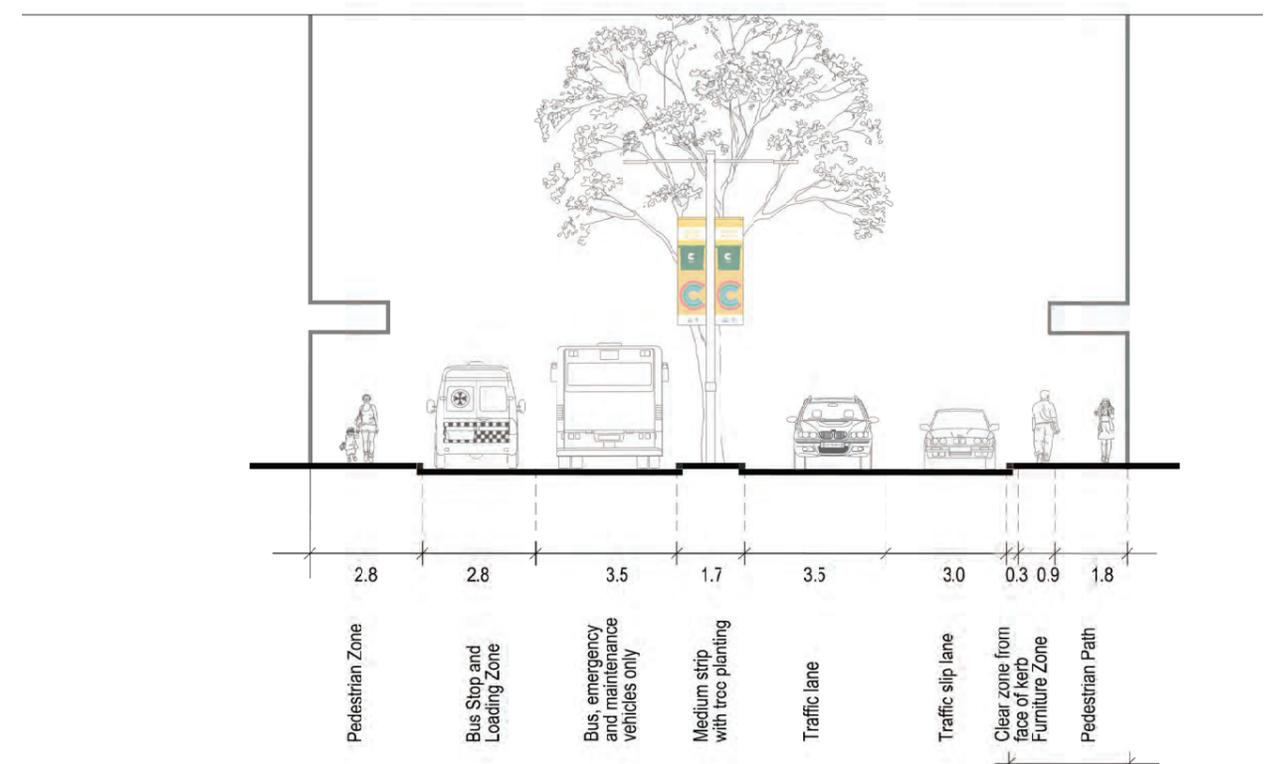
Dunmore Street Section near Garfield Street - Looking West
